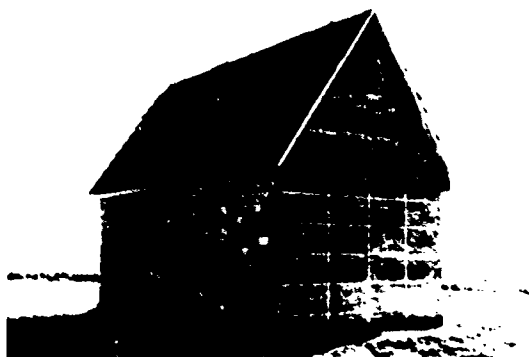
DAMAGE TO WEAVER TILE STRUCTURE NO. 3
